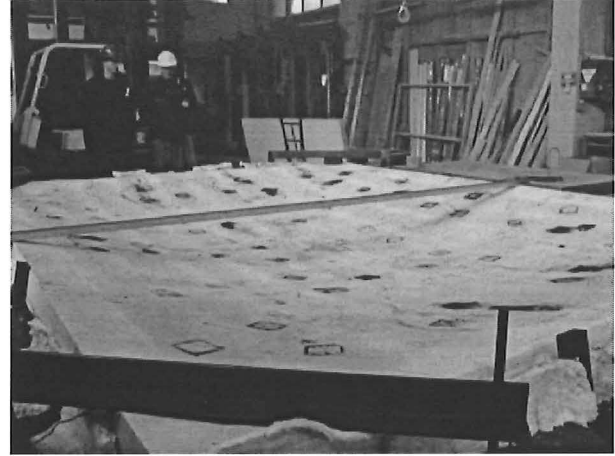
Steam seeping through the diagonal cracks at one of the corners of the Hibond slab. The crack had extended the full depth of the slab.
